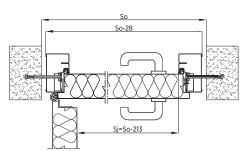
Installation of a single-leaf door to a masonry wall – wrap-around frame with a thermal break – vertical cross-section
